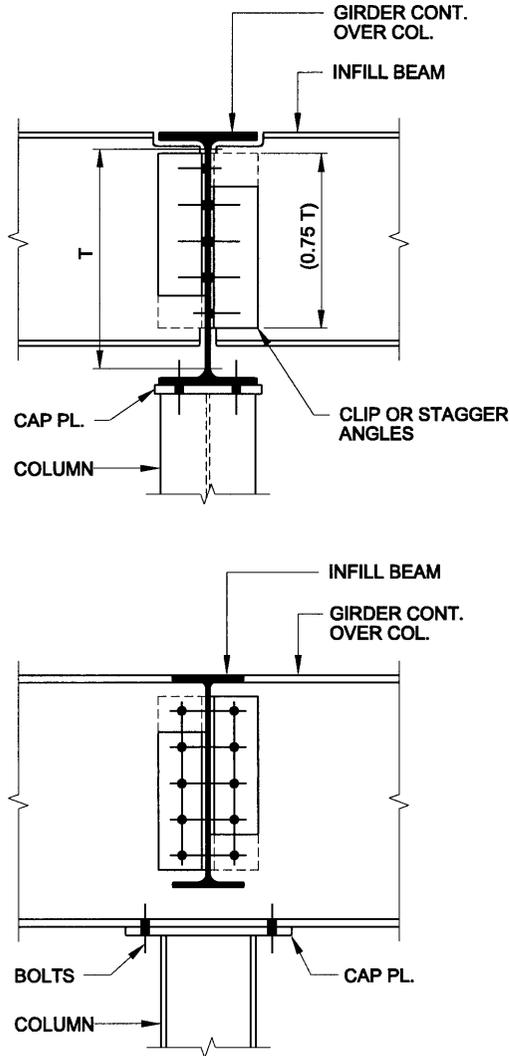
Beam framing continuously over column top, stability provided with connections of infill beams.
